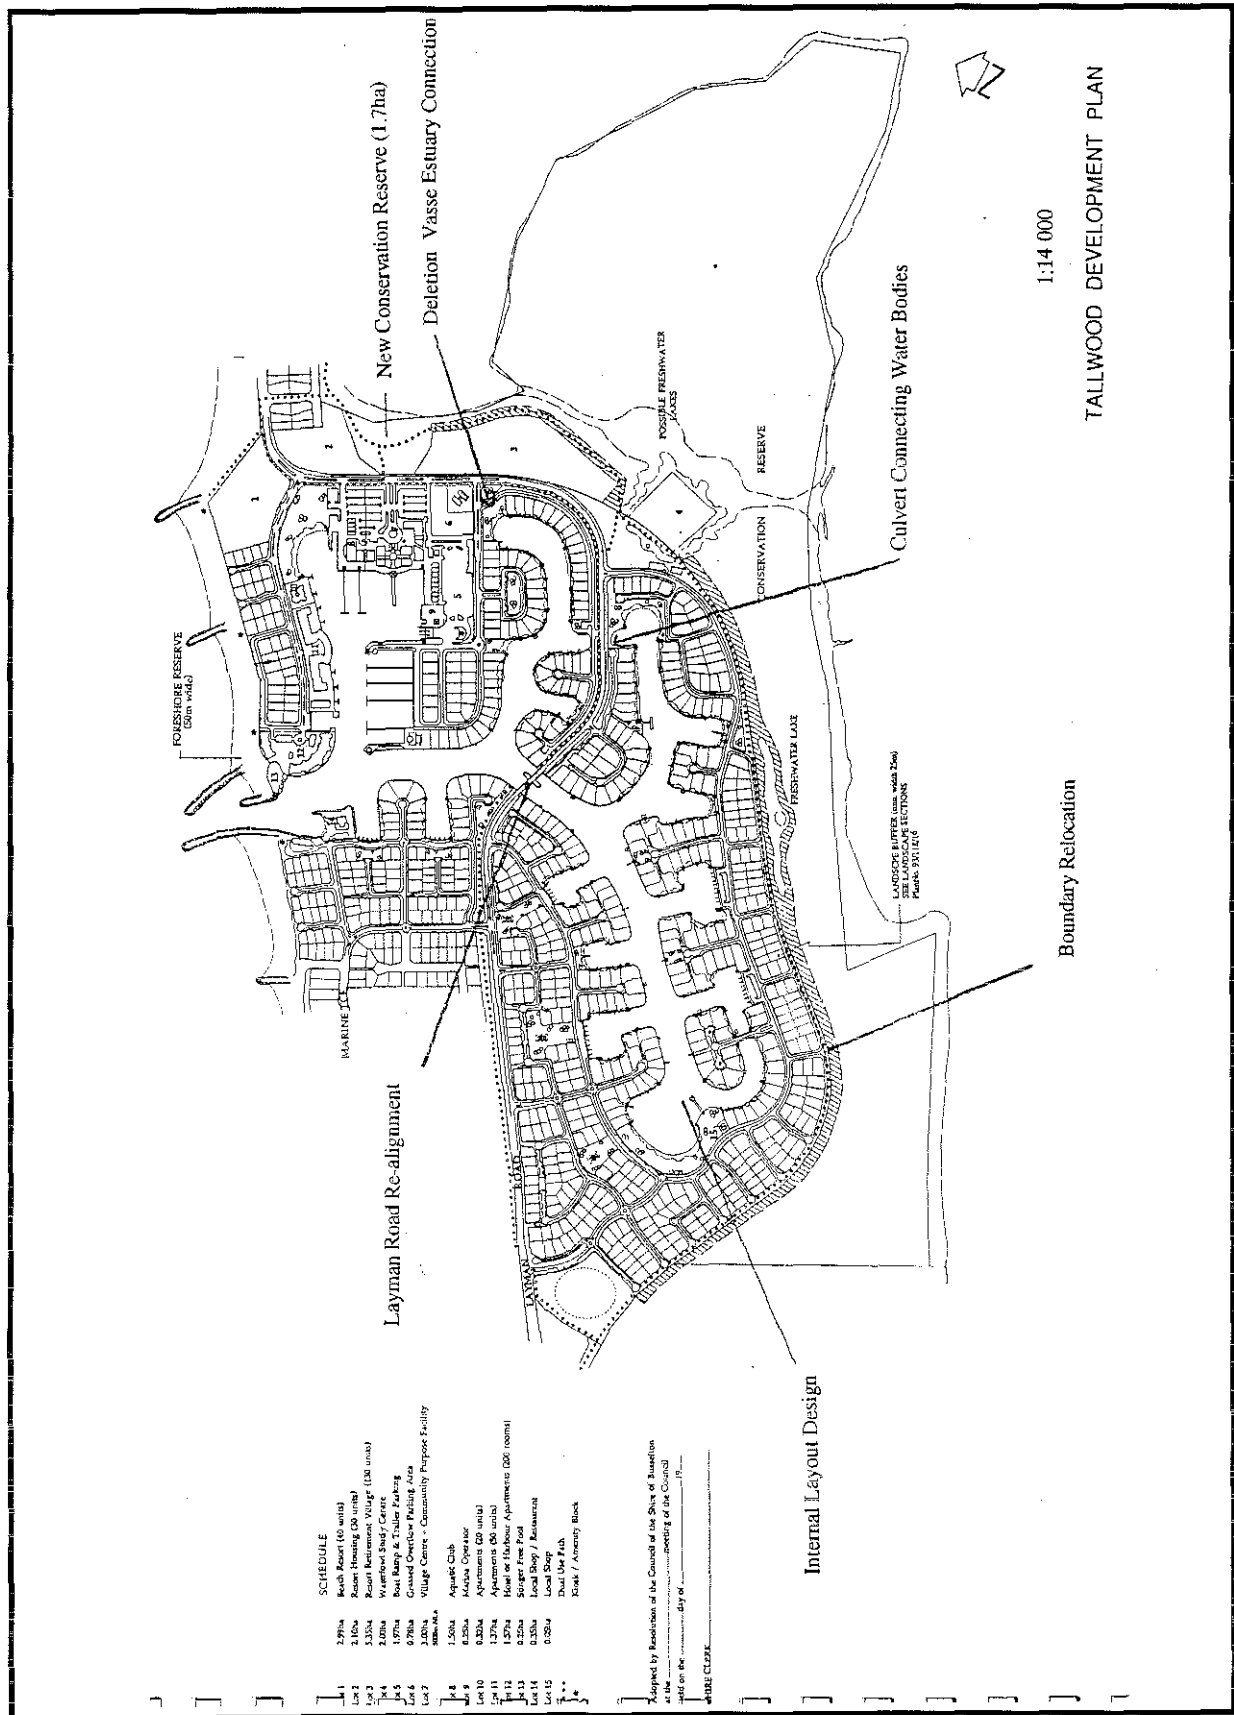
Tallwood Development Plan (LeProvost Dames & Moore, 1995).
